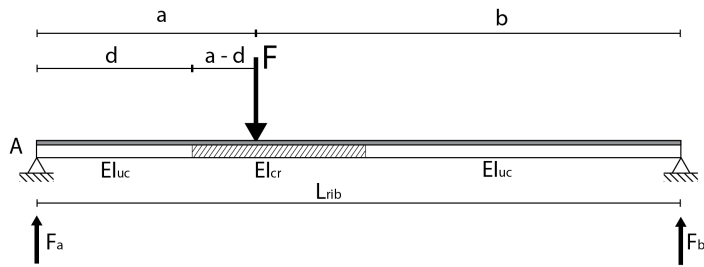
The longitudinal cross-section of a rib with a cracked zone and two uncracked zones
